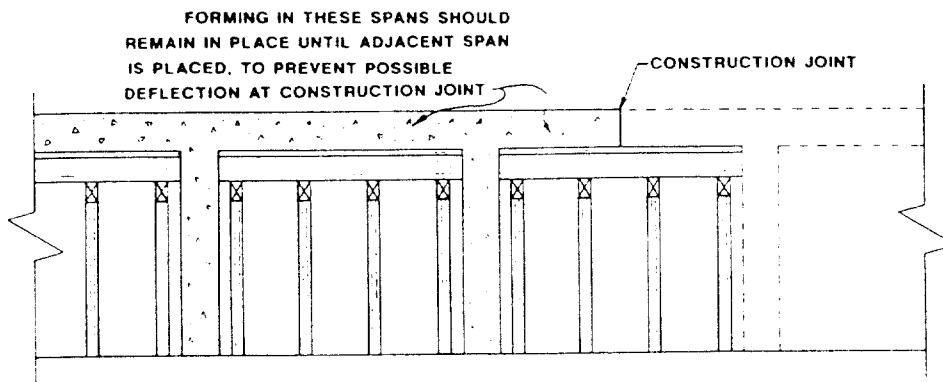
Forming and shoring restraints at construction joints in supported slabs
